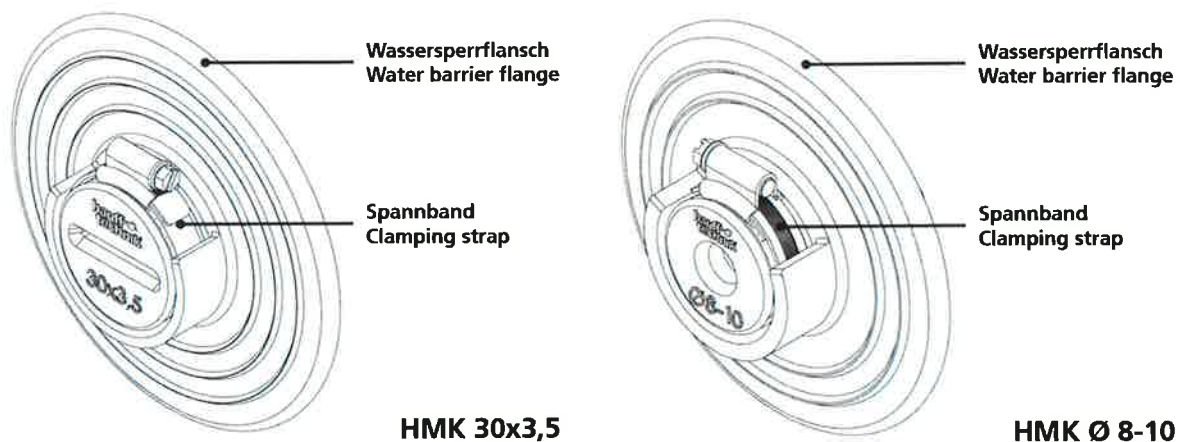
Earthing wall collar Hauff HMK 30 x 3,5 and Hauff HMK Ø 8 – 10 - manufacturer's drawing.
